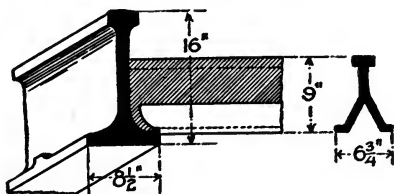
Cast-iron Girders and Floor-beams removed from Old Boston Public Library.
